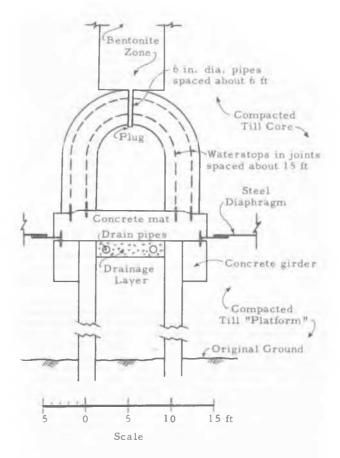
Proposal for Double Wall Cutoff with Observation Gallery
